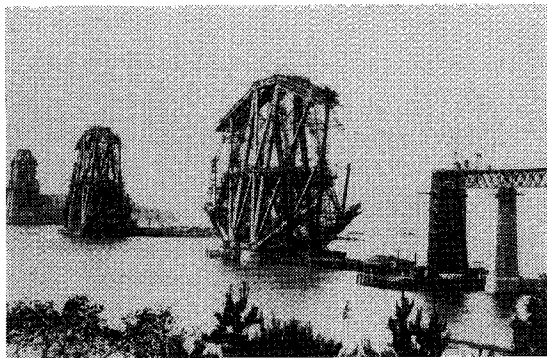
Construction of Forth Railway Bridge (Completed in 1890)
